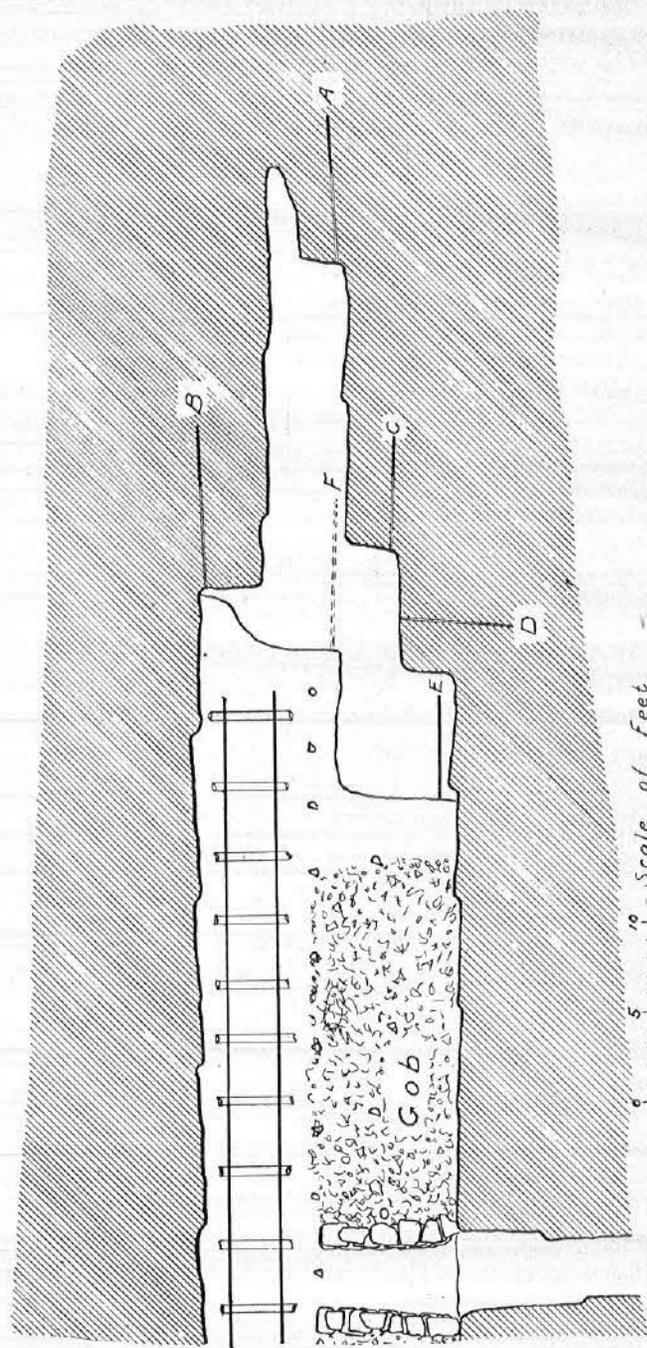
Plan of an entry in triple-bench coal, Huntington.
